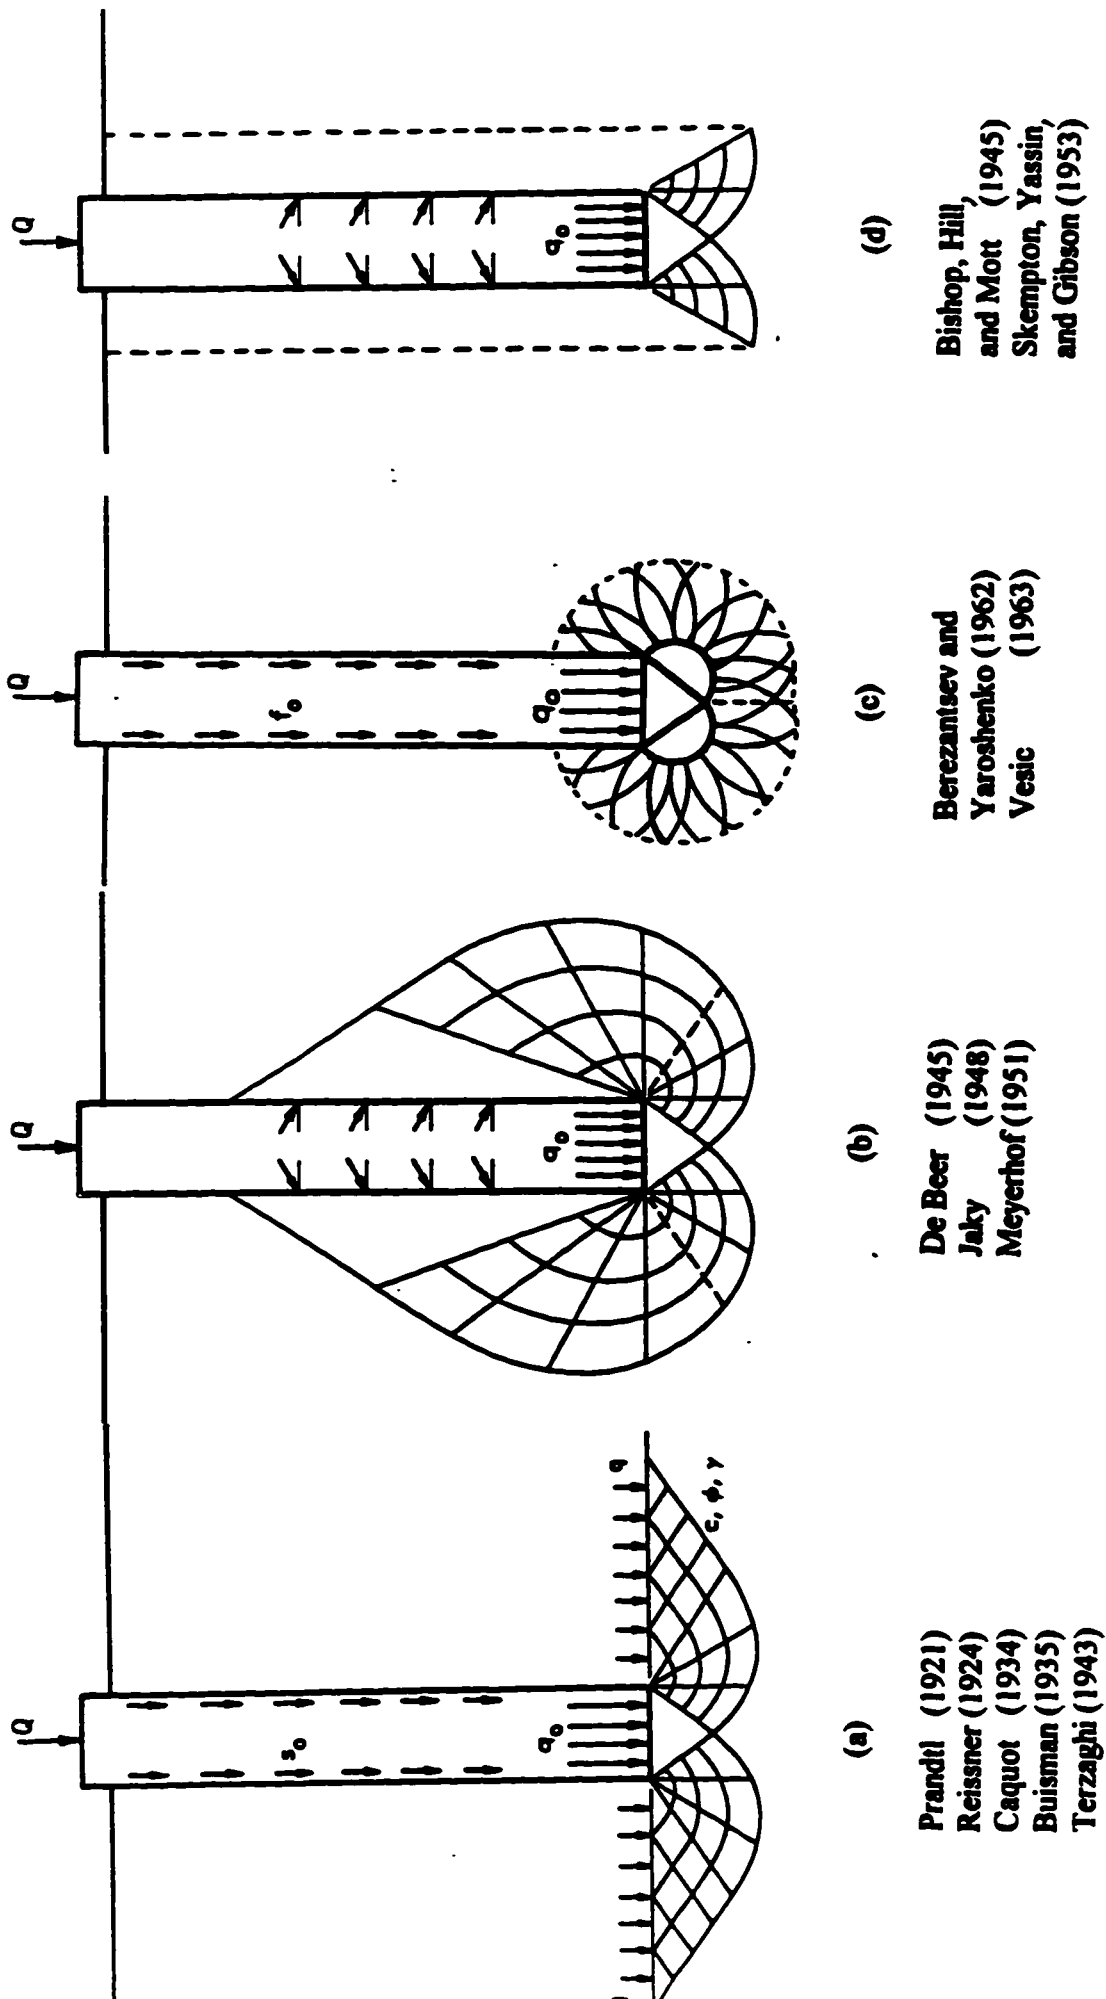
Assumed failure mechanism under pile foundations (after Vesic, 1967)
